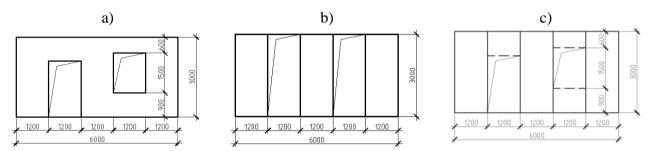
Ways of accounting openings in modeling work of shearwalls
